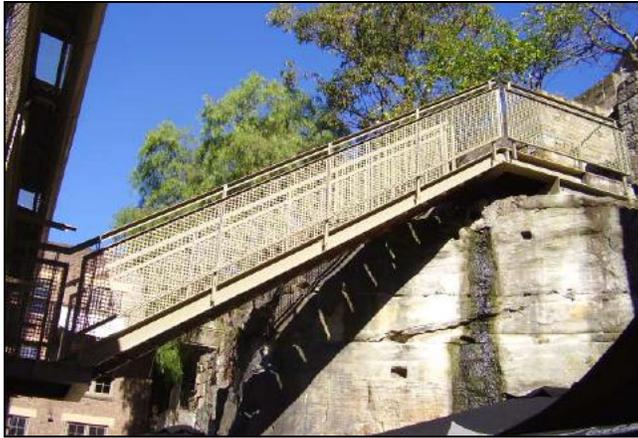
View of the northern stair which connects to the rear deck and walkway of the subject buildings.
